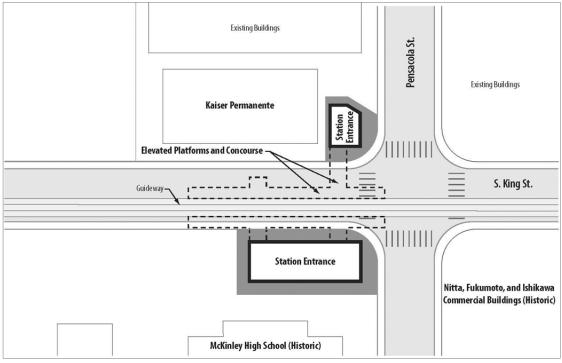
Beretania Street Tunnel Alternative Pensacola Street Station
